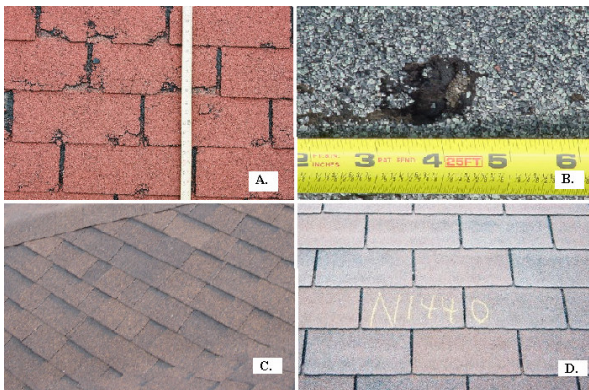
A) Location 76-Multiple fractures in old organic shingles; B) Location 16-Hail impact puncture in shingle that overlaid wood shingles; C) Location 5-No hail impact damage to modified bitumen shingle; D) Location 81-No hail impact damage to shingle in area with a large quantity of small hailstones.
